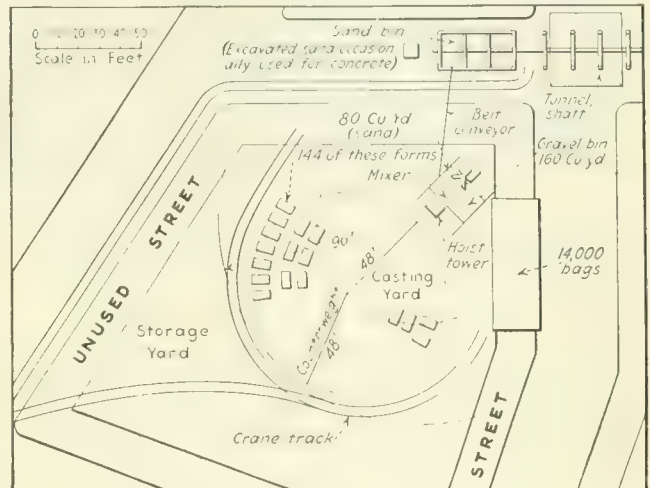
LAYOUT OF RADIAL CASTING YARD
